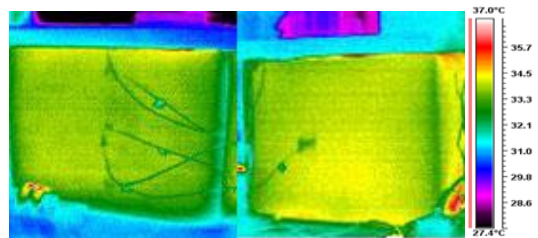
IR image of wooden (left) and concrete (right) wall in the same heating condition.
